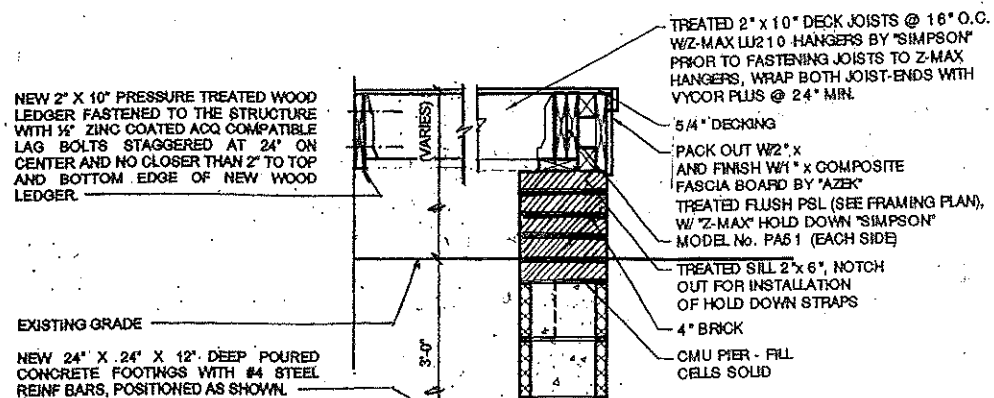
DETAIL - SIMPSON HD5A HOLD DOWN CONNECTION
